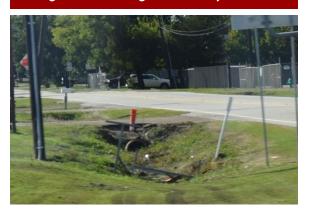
Roadside Ditch with Standing Water; Ditches May Not Have Sufficient Grade To Drain Properly
